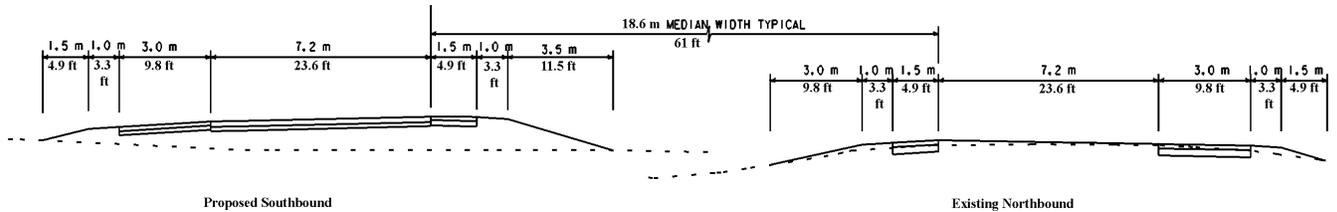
Proposed Typical Cross-Section: Alternative 2
